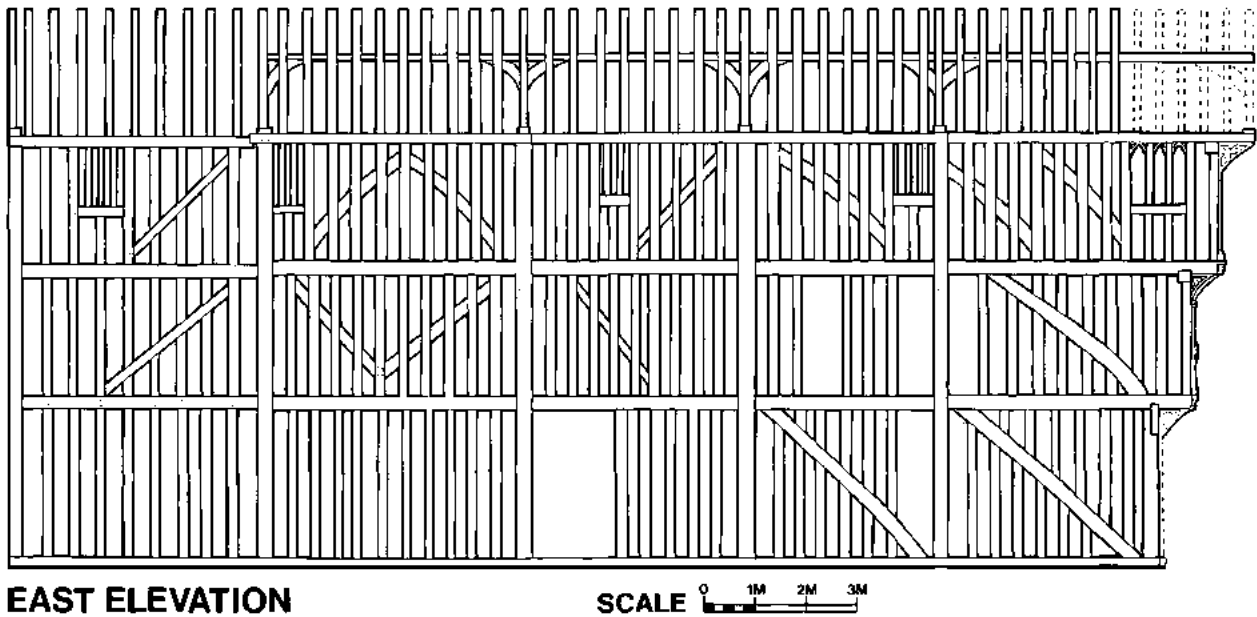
The Red Lion, Colchester. East elevation of the timber frame.
